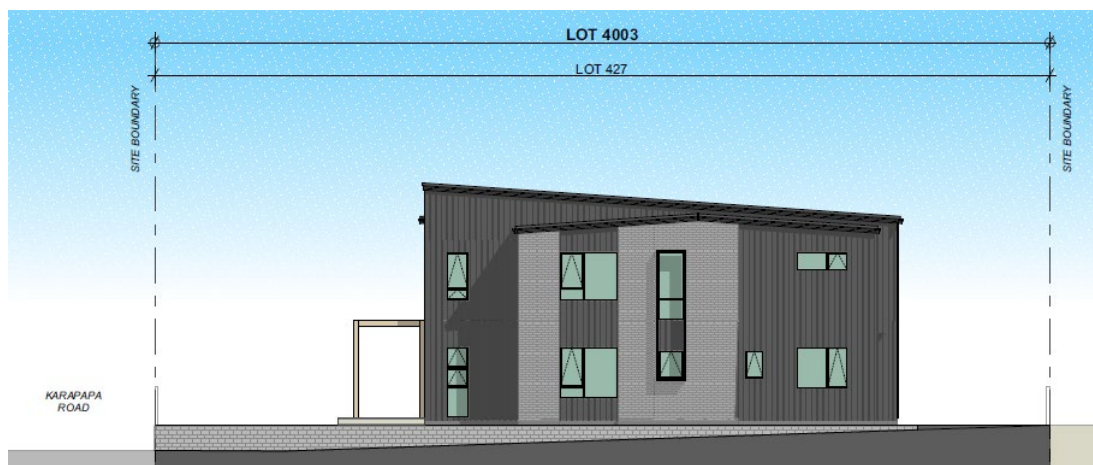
Typical "side" elevation fronting public streets (source: Woods)
